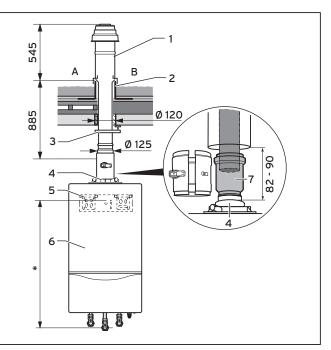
Fitting the appliance and vertical flue duct to a building with a flat roof
